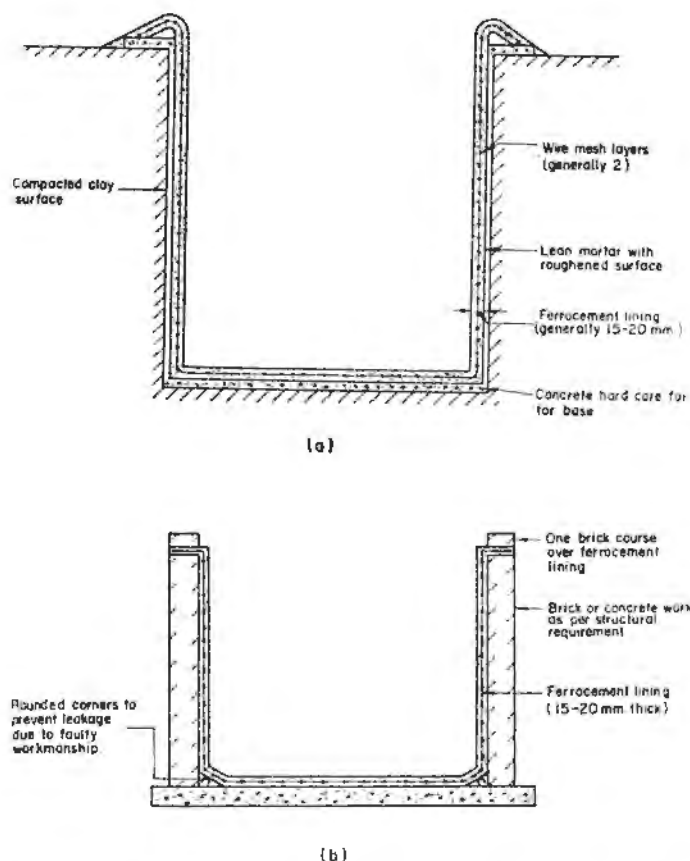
Ferrocement treatment of pits: (a) Earthen pit, (b) Masonry pond.
